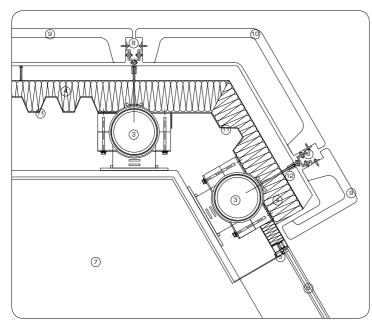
GRP louvres 2. Perforated GRP louvres 3. Secondary steel tube facade structure 4. Thermal insulation 5. Glazing frame 6. Double glazing 7. Primary steel structure (insulated and clad) 8. Fixing bracket 9. GRP cladding 10. GRP ridge piece 11. Profiled metal deck 12. Standing seam metal deck
